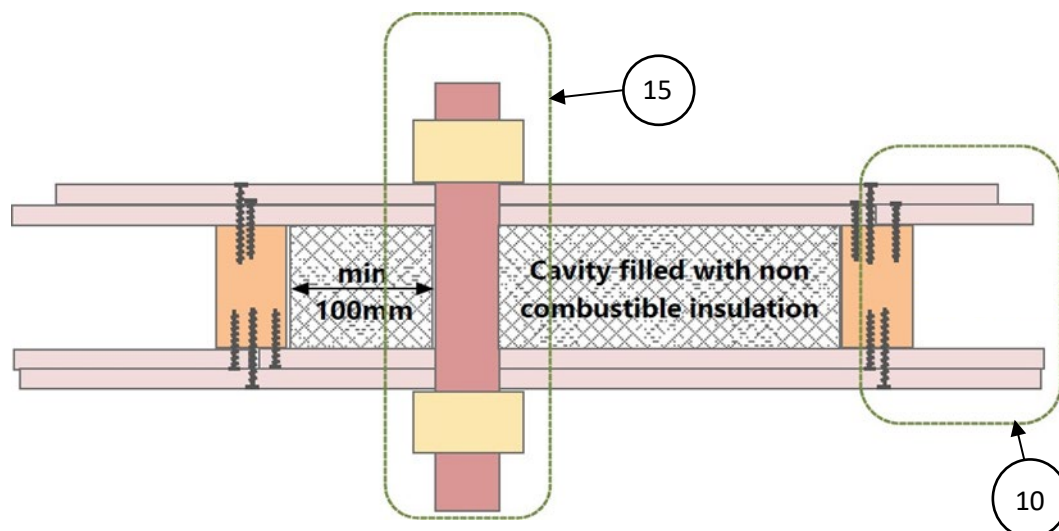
Proprietary plastic pipe protection systems used with cavity insulation – Plan view
